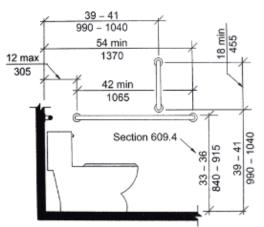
Bathroom Section showing Grab Bar Locations (ICC)
